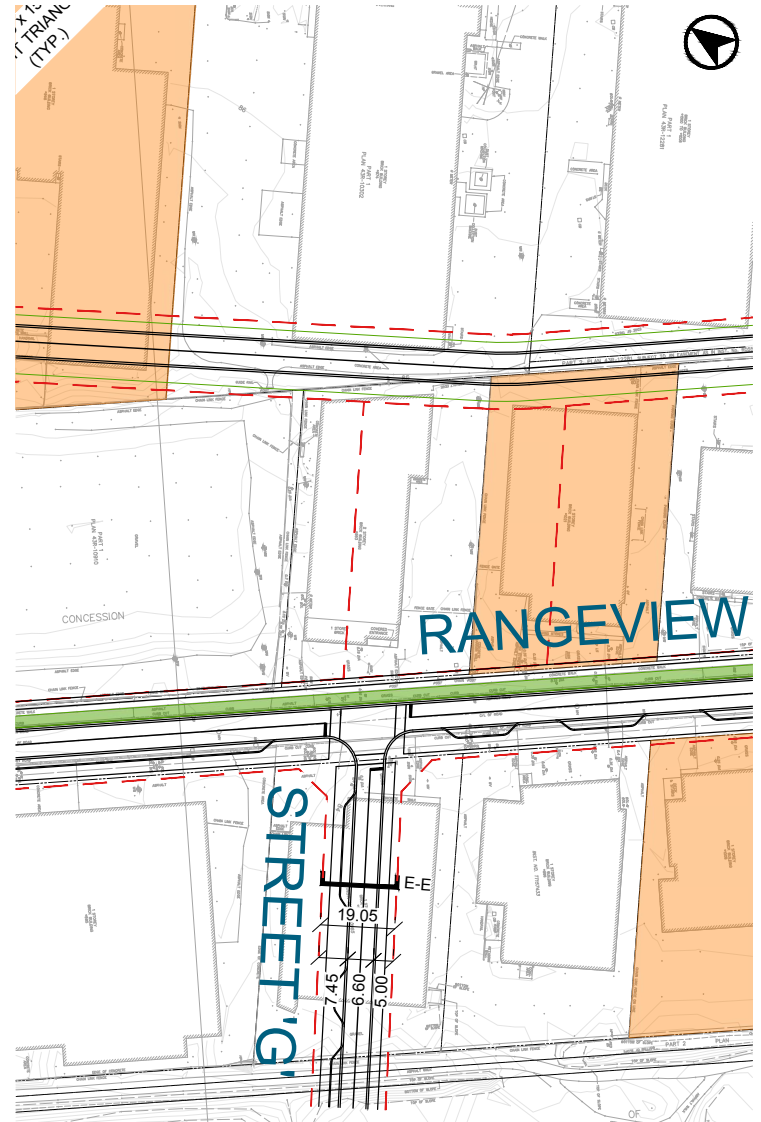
PROPOSED STREET 'G' EXTENSION - FUNCTIONAL PLAN & CROSS-SECTIONS
